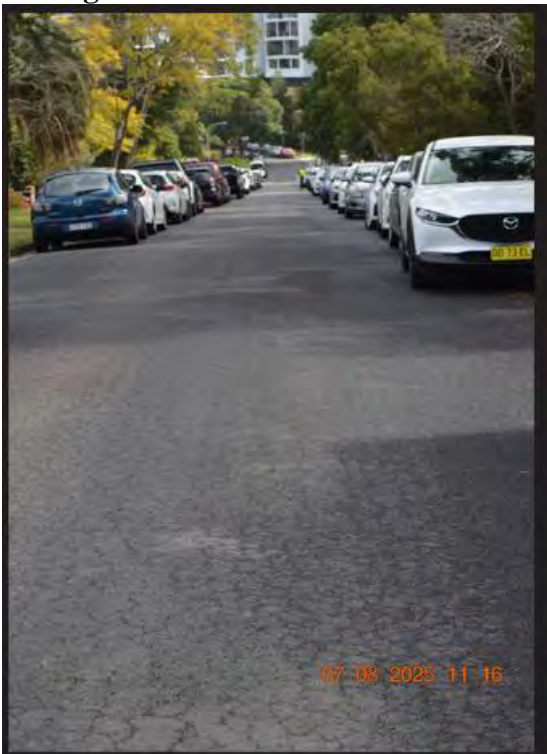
Streetview image along Dawes Avenue, looking north-west
